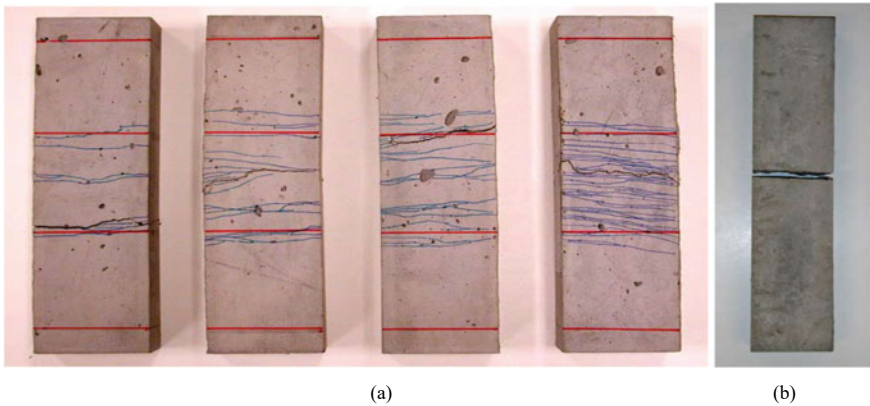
Crack pattern of a 4 ECC samples and b 1 conventional concrete sample. Adapted from [1]
